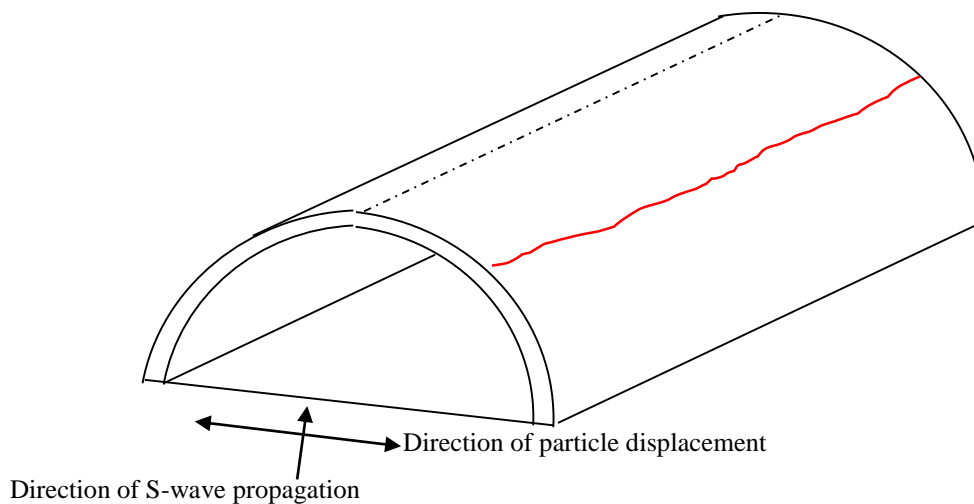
Mechanism of spalling of tunnel lining
